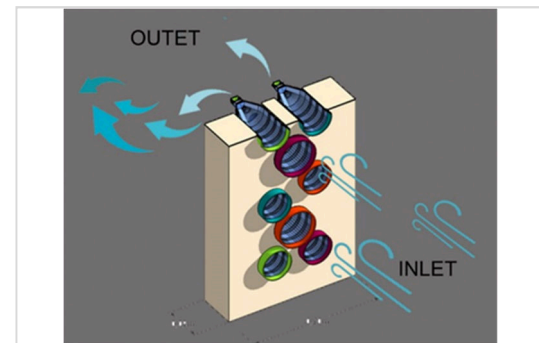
Detail of design adjustments to airing requirements during post-disaster conditions
